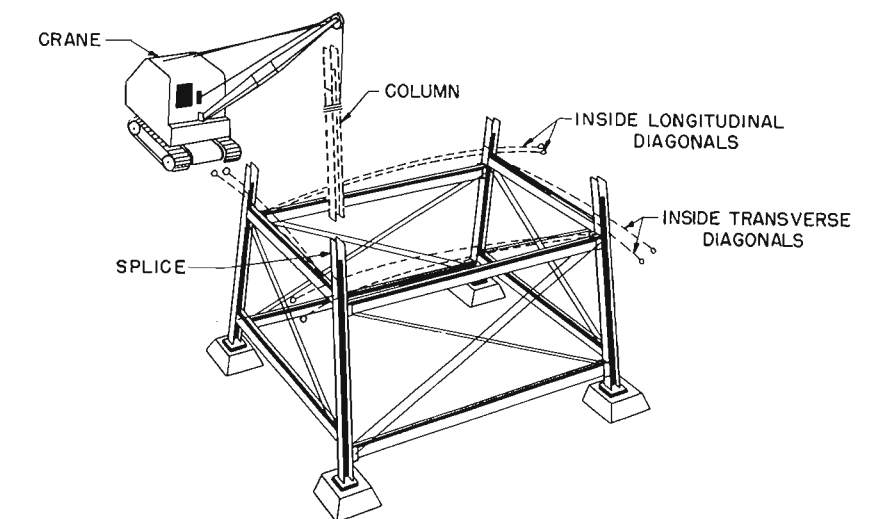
Crawler-mounted crane erecting steel tower from ground.
